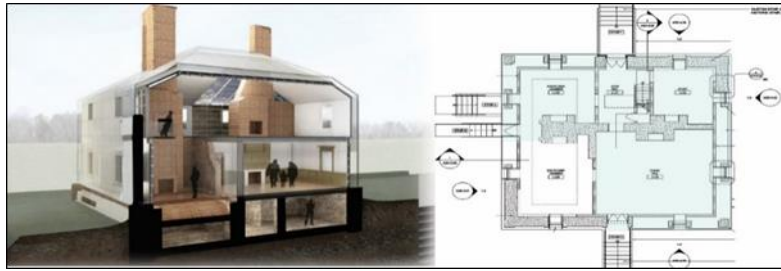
Shows the remnants of the Mencken Building, and the use transparency in reconfiguring and constructing the building.
